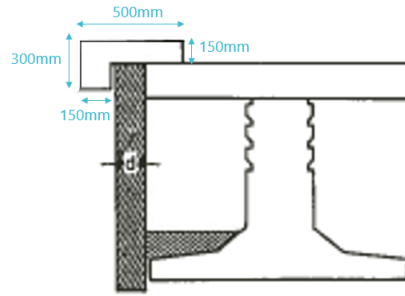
Dimensions of the edge structure's concrete concrete corner detail (Nr. 2.2.1 of the Spanbeton Bulletin technical series).
